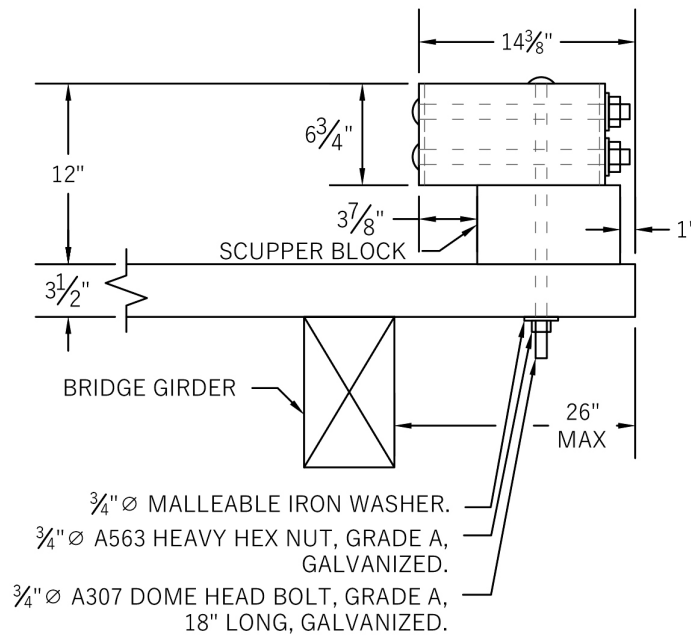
Graphic. Design alternative 3 (recommended) for modified WVBR design for use on 4-by-12 plank decks.
